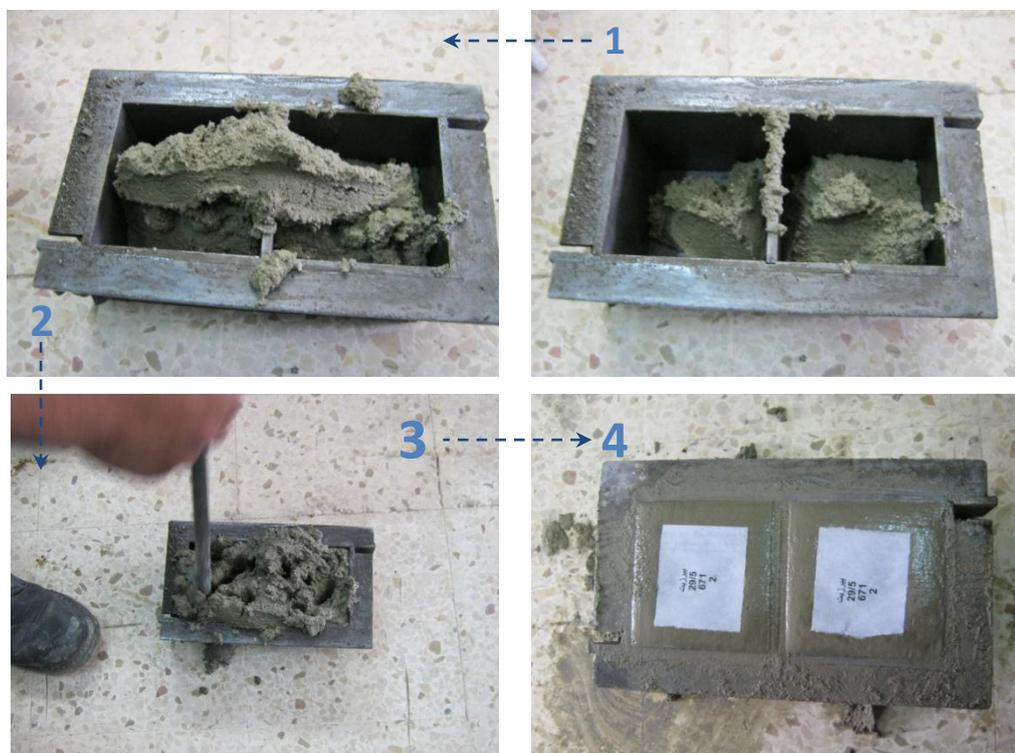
| Molding steps of biosolids-amended cubes (10 mm x 10 mm x 10 mm) – @ Ramallah Laboratory
